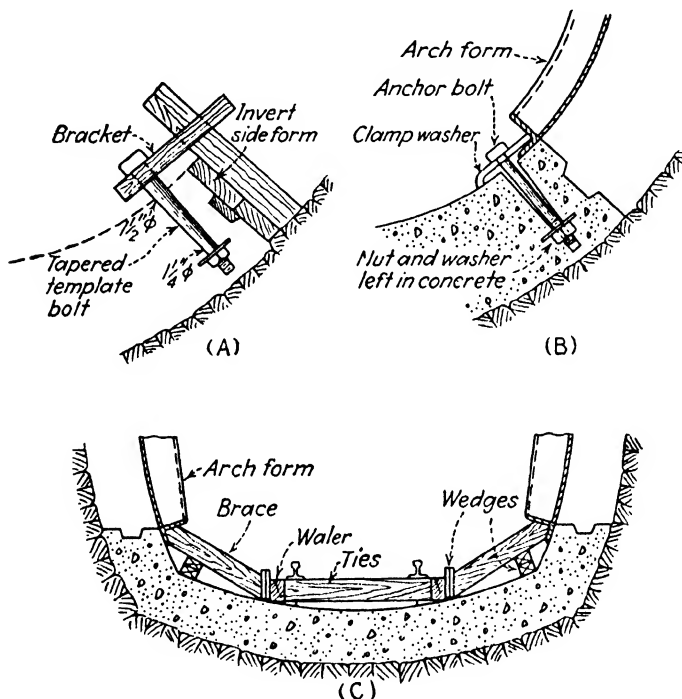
Methods of fastening and bracing forms at the invert. A, template for setting anchor bolts in the invert; B, clamp for holding bottom of arch form; C, typical bracing at invert for telescoping forms.
